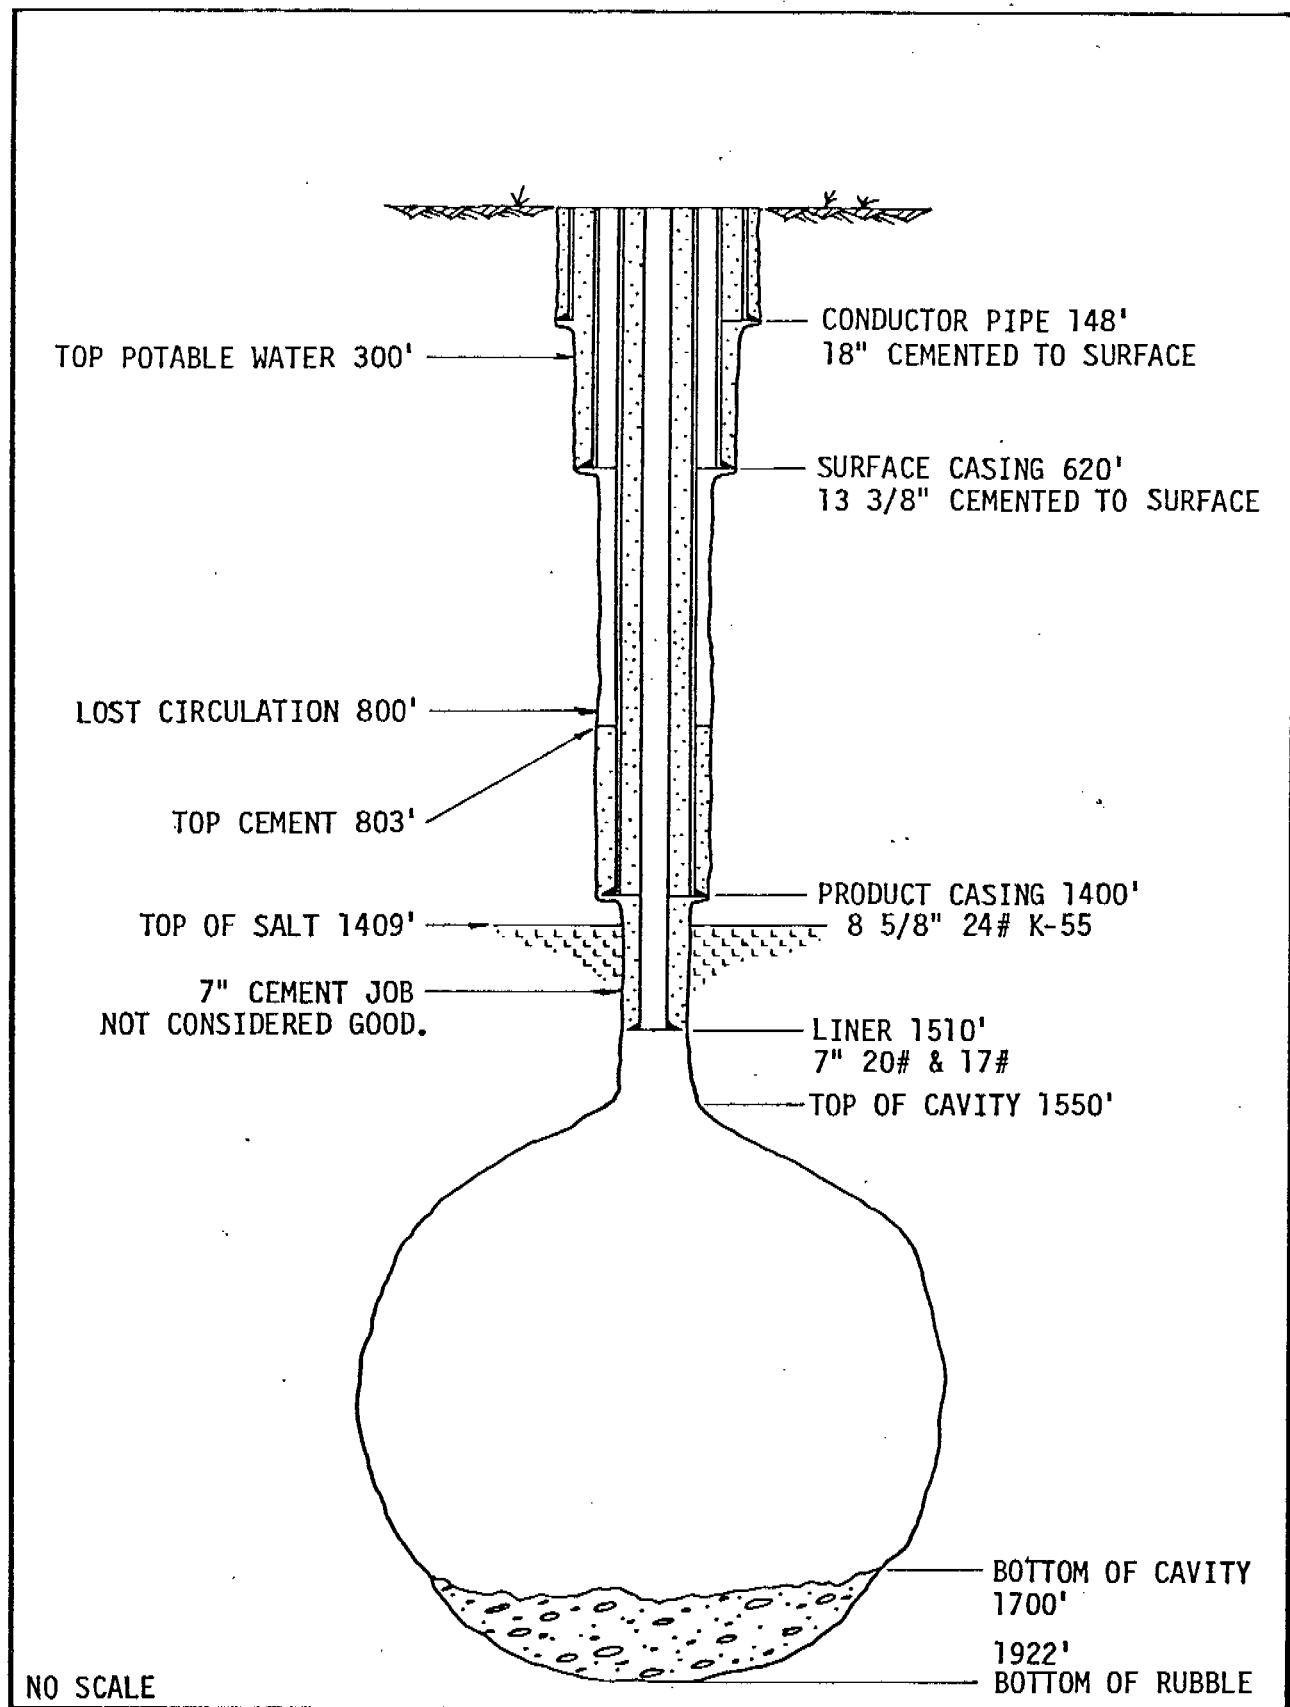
Sketch Showing Present Construction of Storage Well No.1
